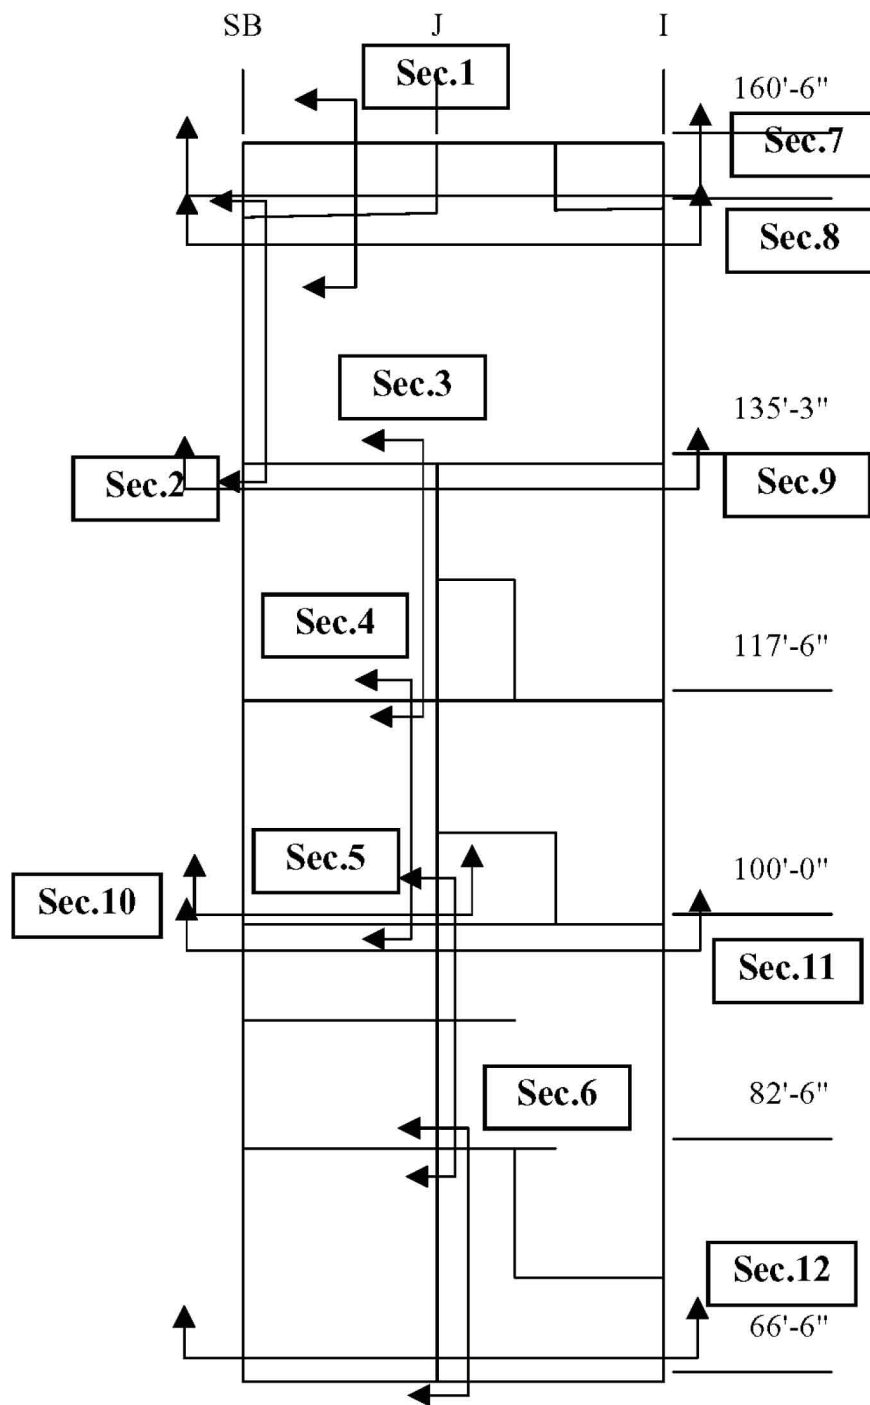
H.5-2 (Sheet 2 of 3) [Wall on Column Line 7.3]
